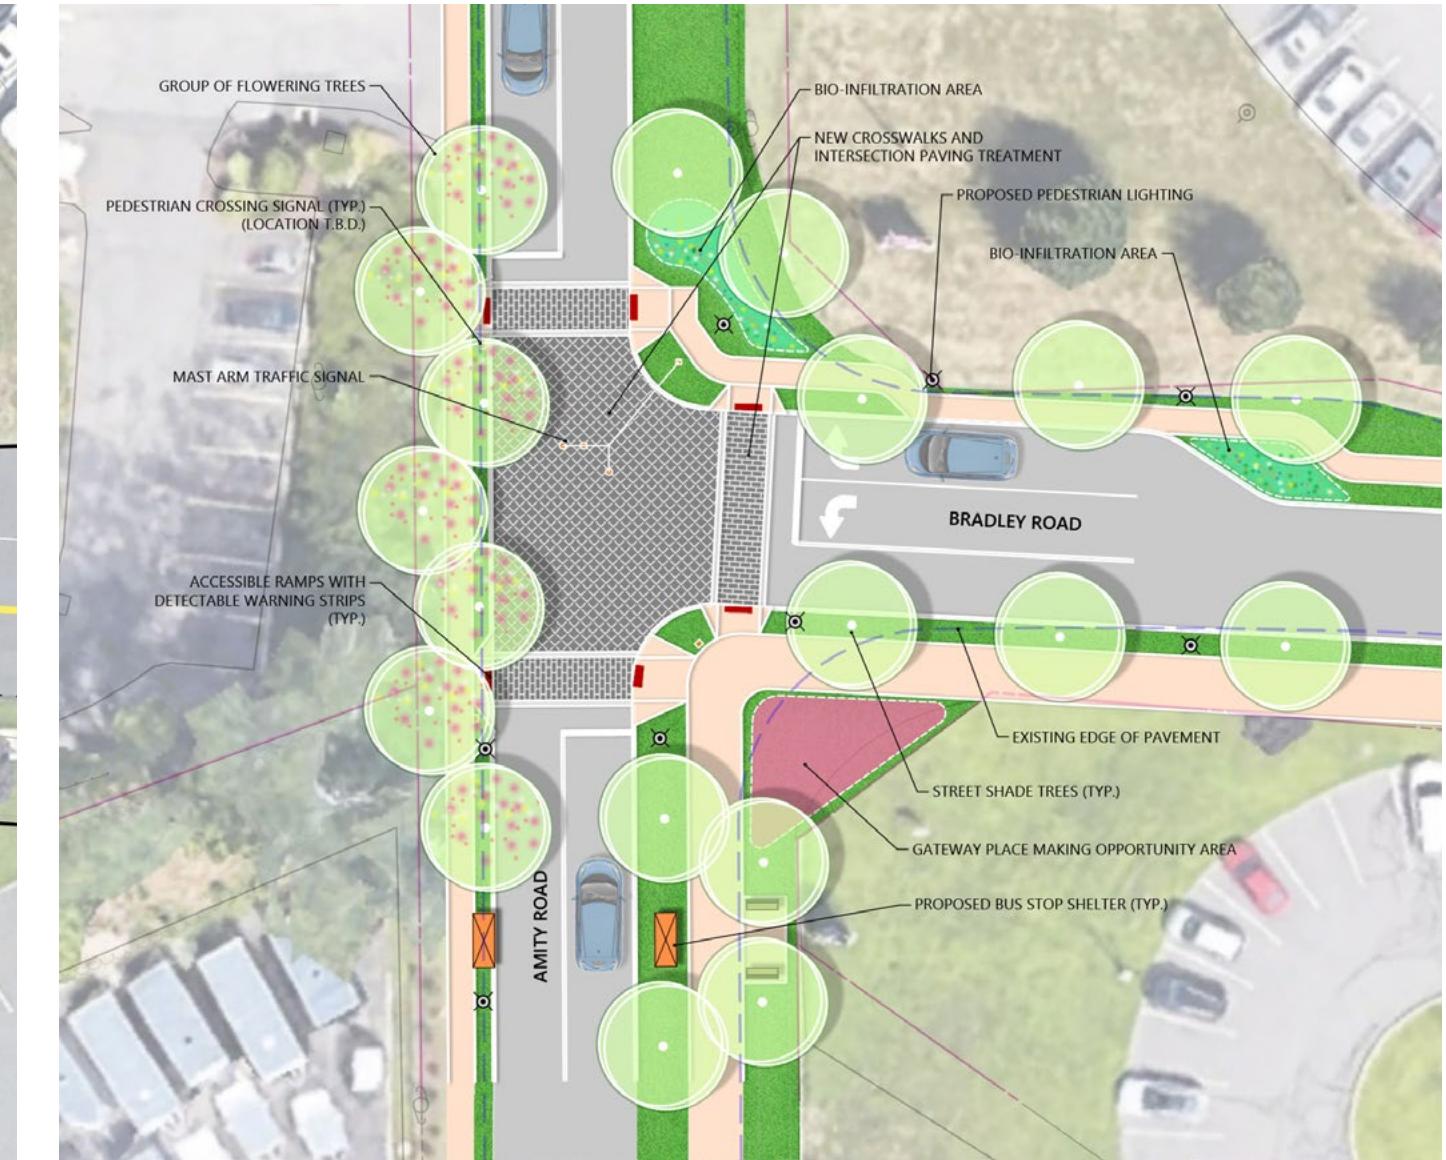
BRADLEY ROAD - INTERSECTION CONCEPT
